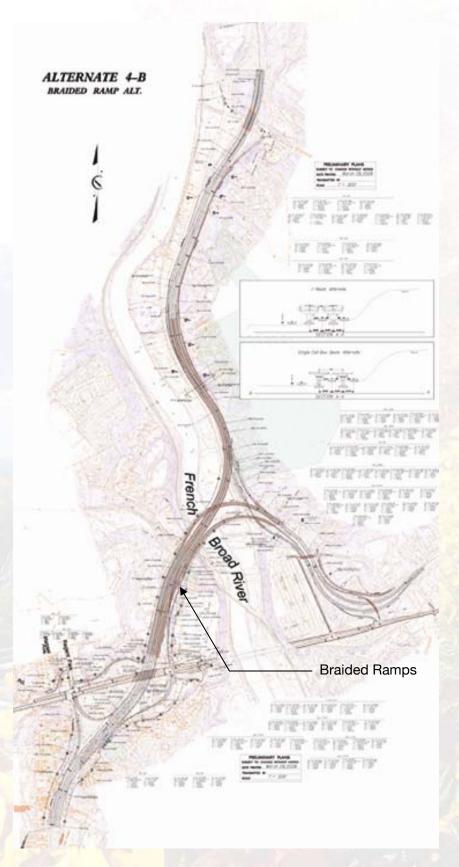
Alternative 4B Braided Ramp Concept (see appendix for 11" X 17" print)
